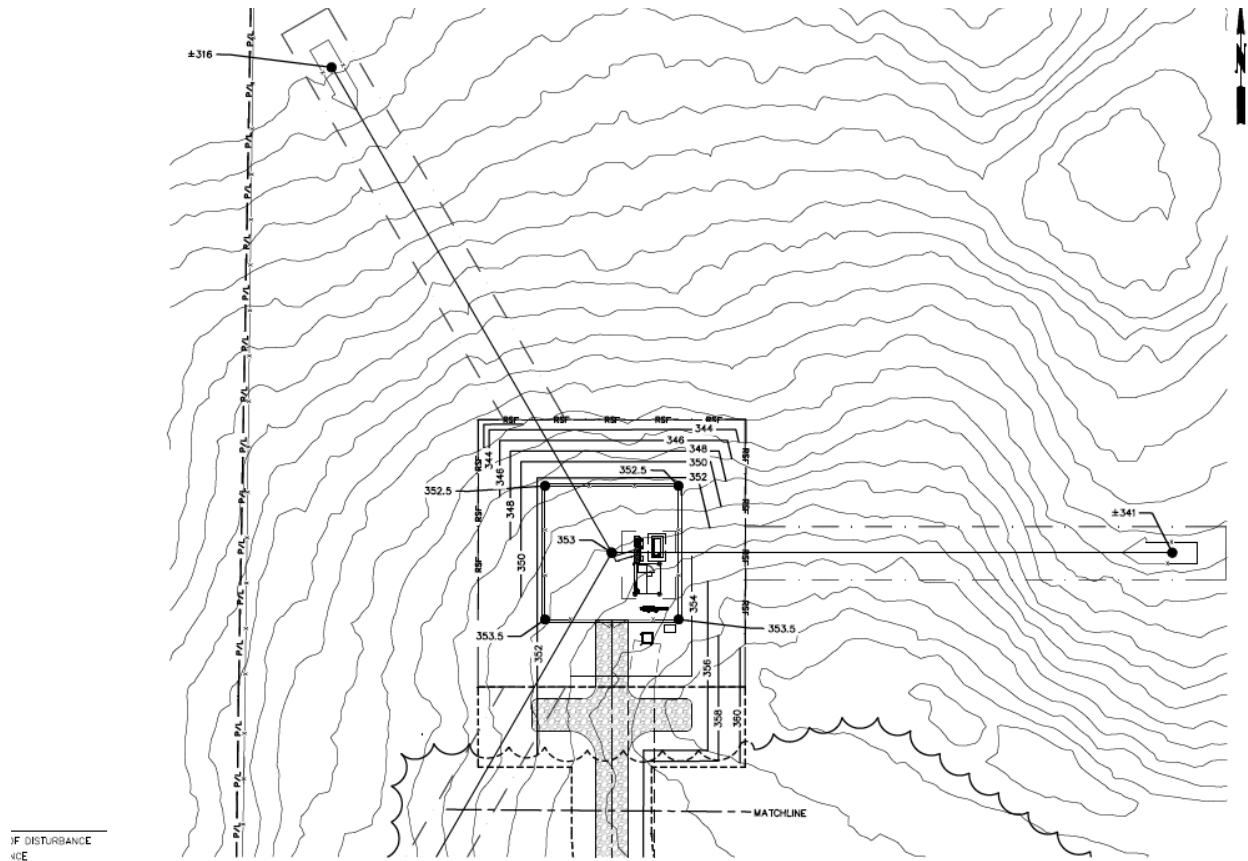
Site Plan with Stormwater and Sediment Controls continued
